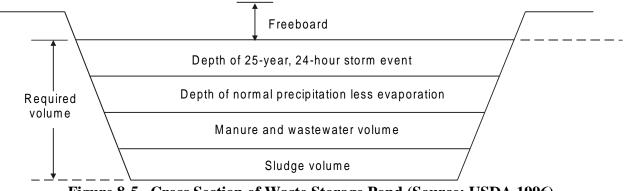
Cross Section of Waste Storage Pond (Source: USDA 1996)
